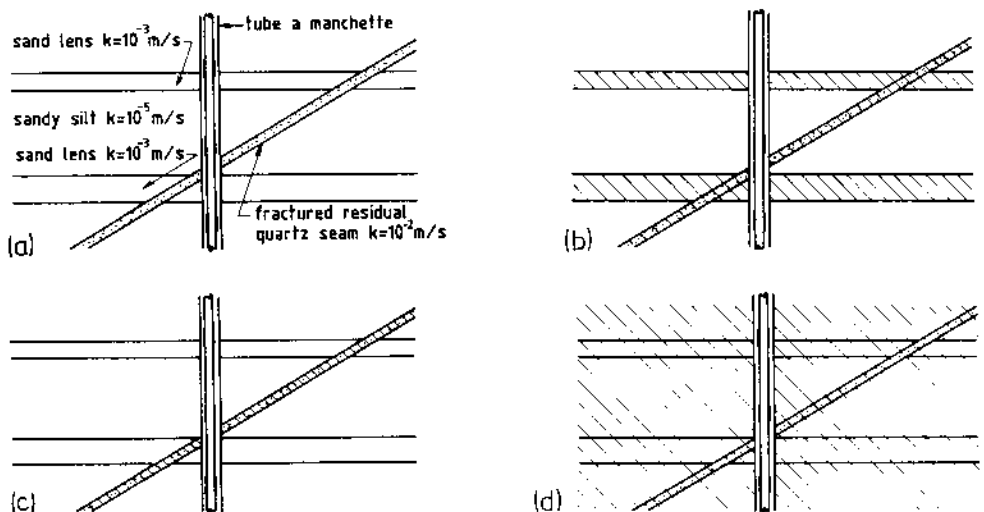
Multiple grout system (Brett 1986) a) ground properties; b) first stage cement grout; c) second stage bentonite grout; d) third stage chemical grout.
